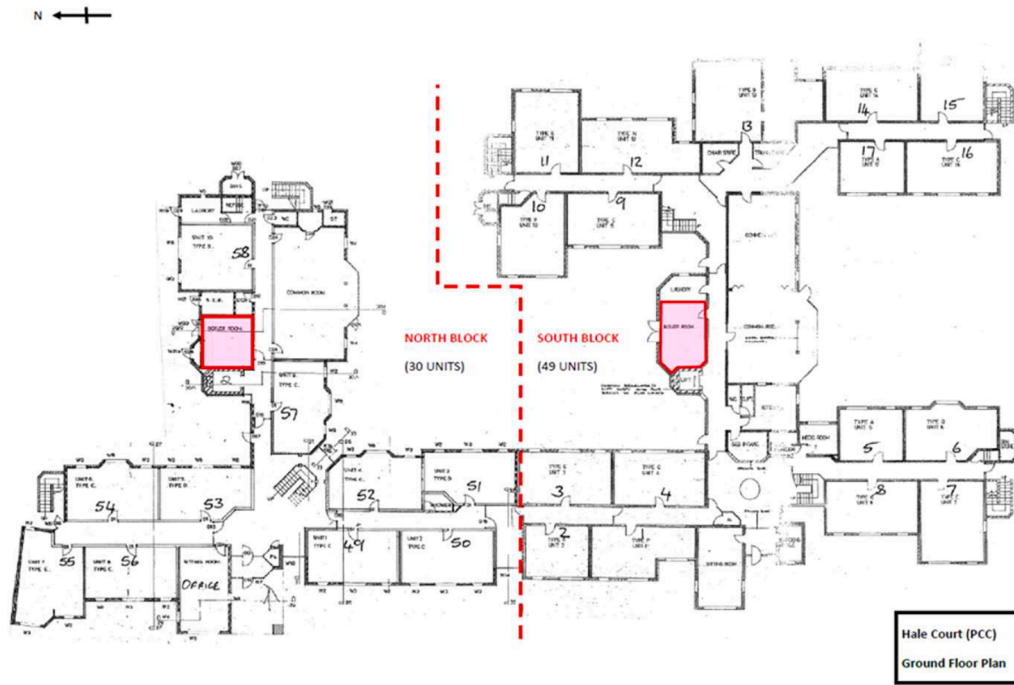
Hale Court – North Block/South Block - Floorplan Ground Floor.
